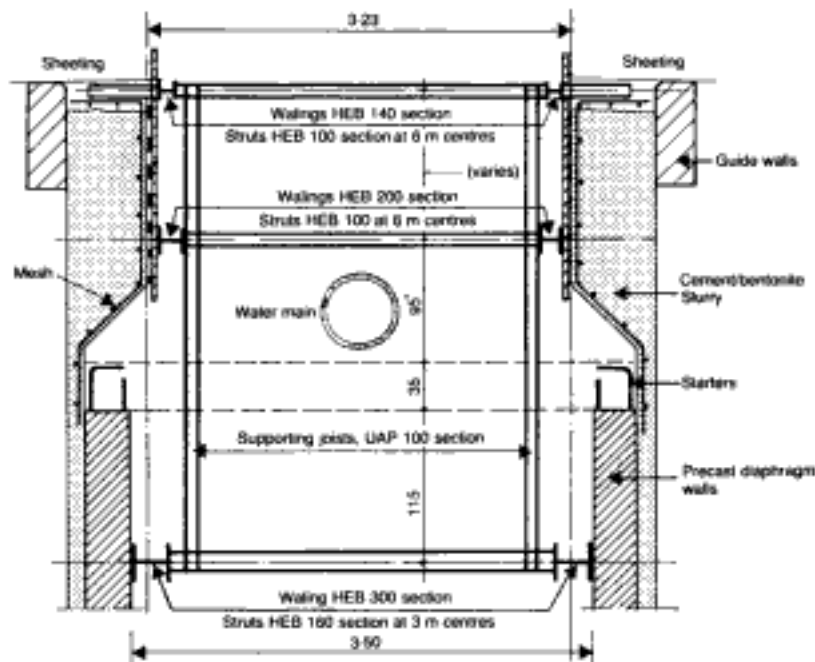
Vitny culvert: cross-section showing temporary soil support above permanent walls (courtesy of Bachy)
